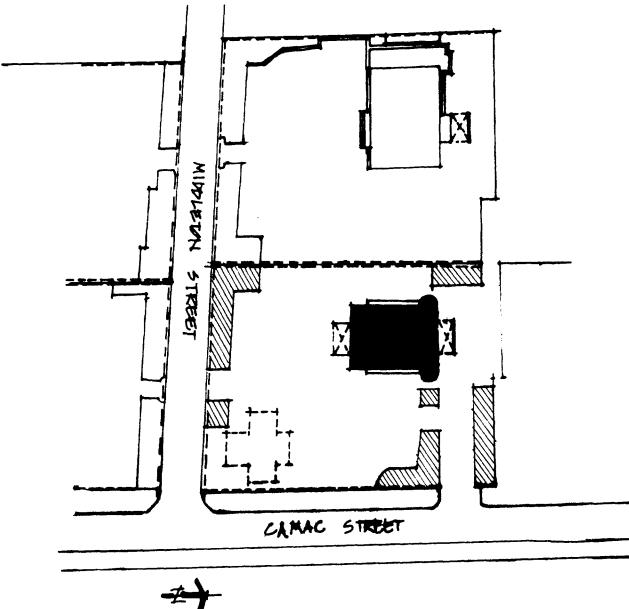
Site plan based on R. B. Smart's Survey of Calcutta, 1887–1909
